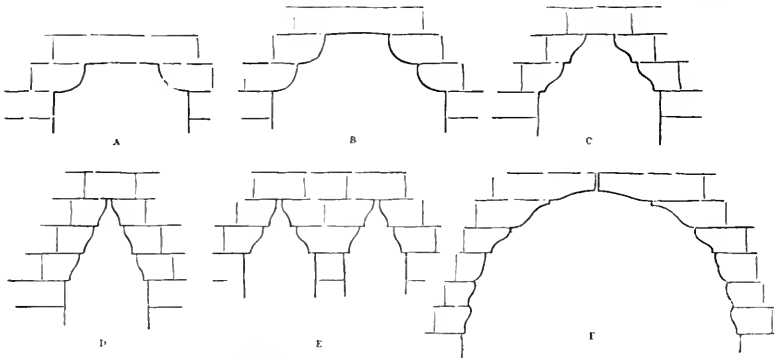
VARIOUS FORMS OF CANTILEVERS AS USED TO SPACE OPENINGS.
